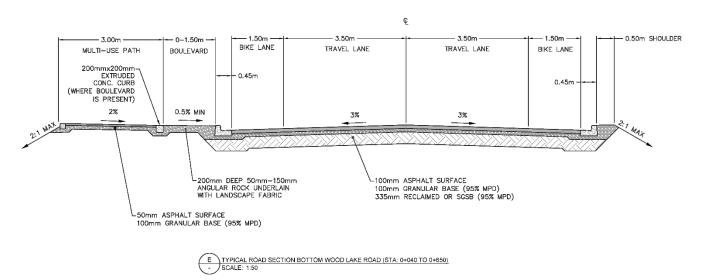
Typical Road Section showing proposed Bottom Wood Lake Road improvements
